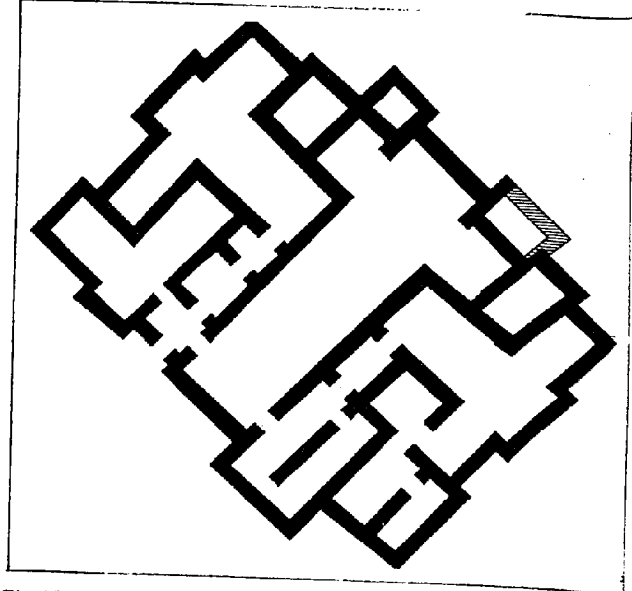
Plan of House in level II at Tell Abadeh (after Jasim 1979, Fig. 2).
